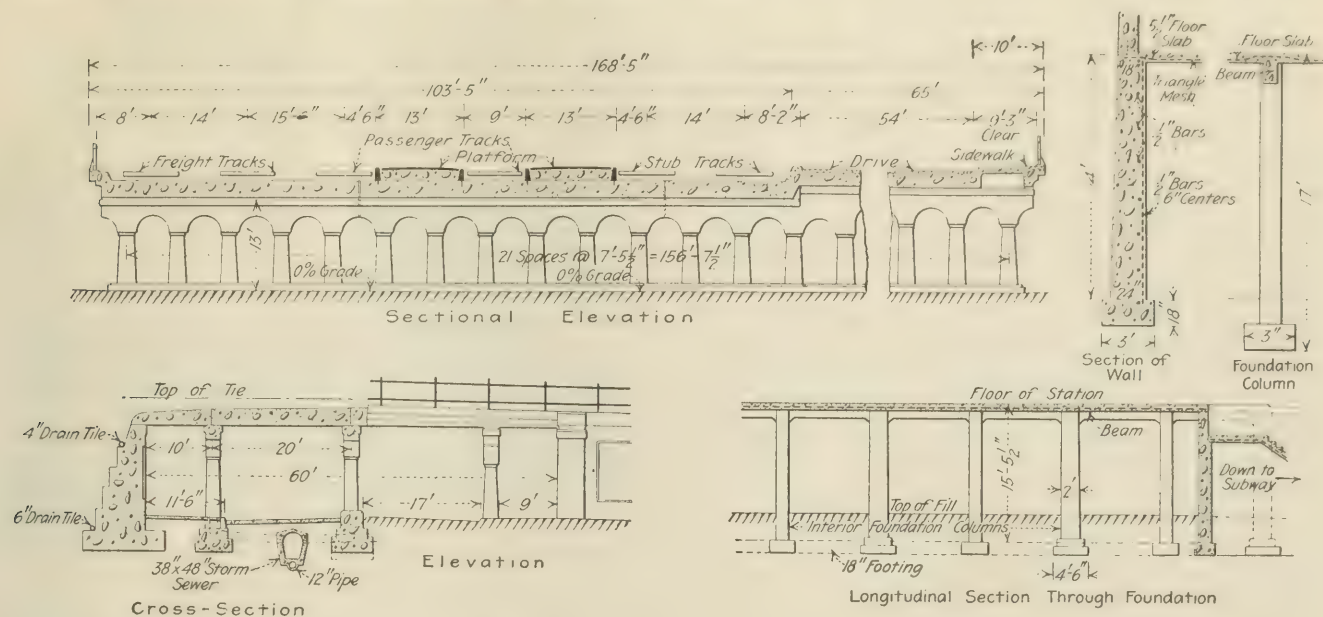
DETAILS OF SUBWAY AND RETAINING WALL AT STATION IN JAMESTOWN
